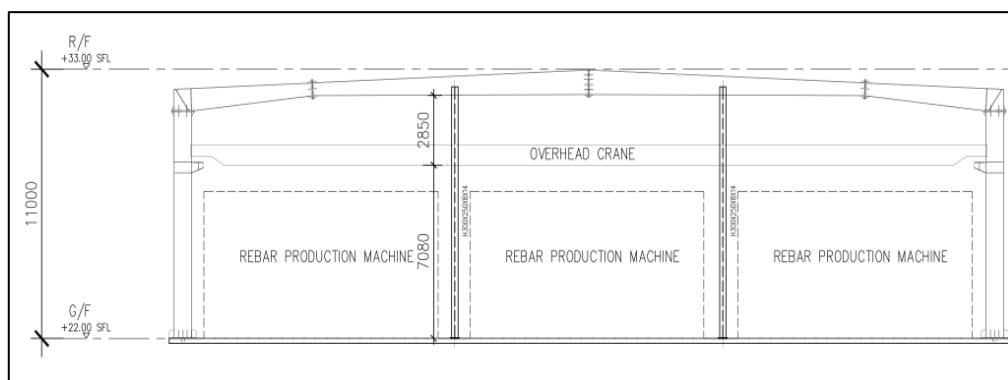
Schematic Section of the Proposed Rebar Workshop
